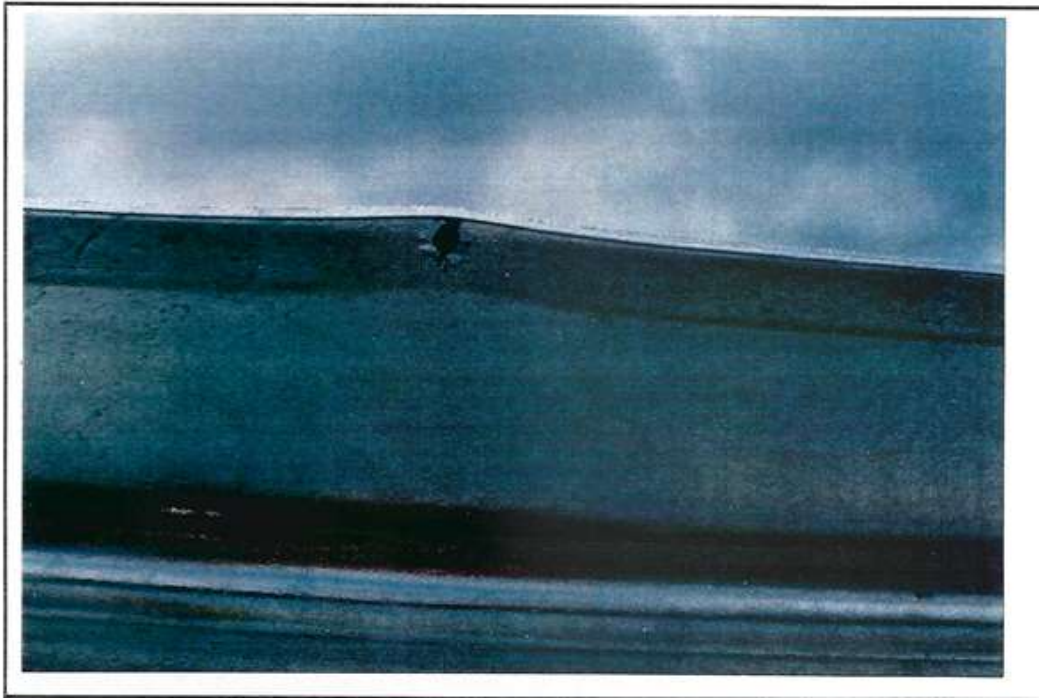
Condition:* Bent Rail (Cracked or Broken Galvanization)
